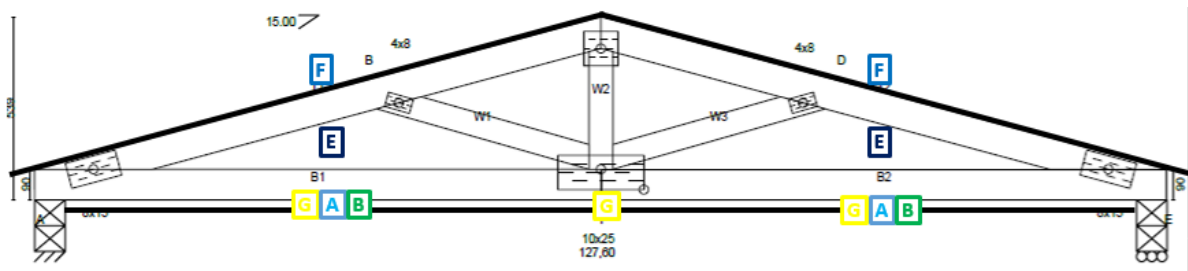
Experiment #1 ceiling and roof device locations, section view
